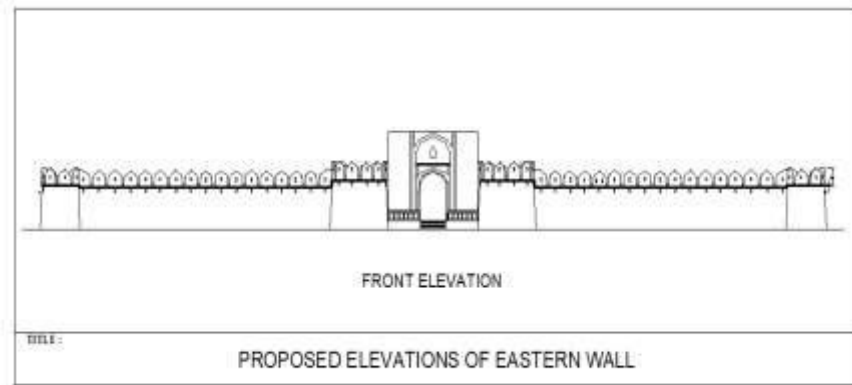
Proposed Elevation Plan (Front Elevation of Easter Wall of Rewat Fort (after Saeed 2020, p.50)
